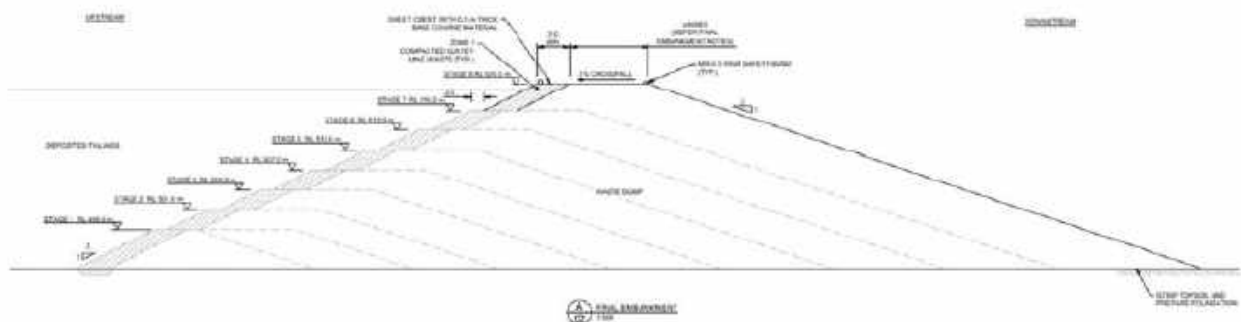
Typical Cross Section IWLTsf Perimeter Embankment
